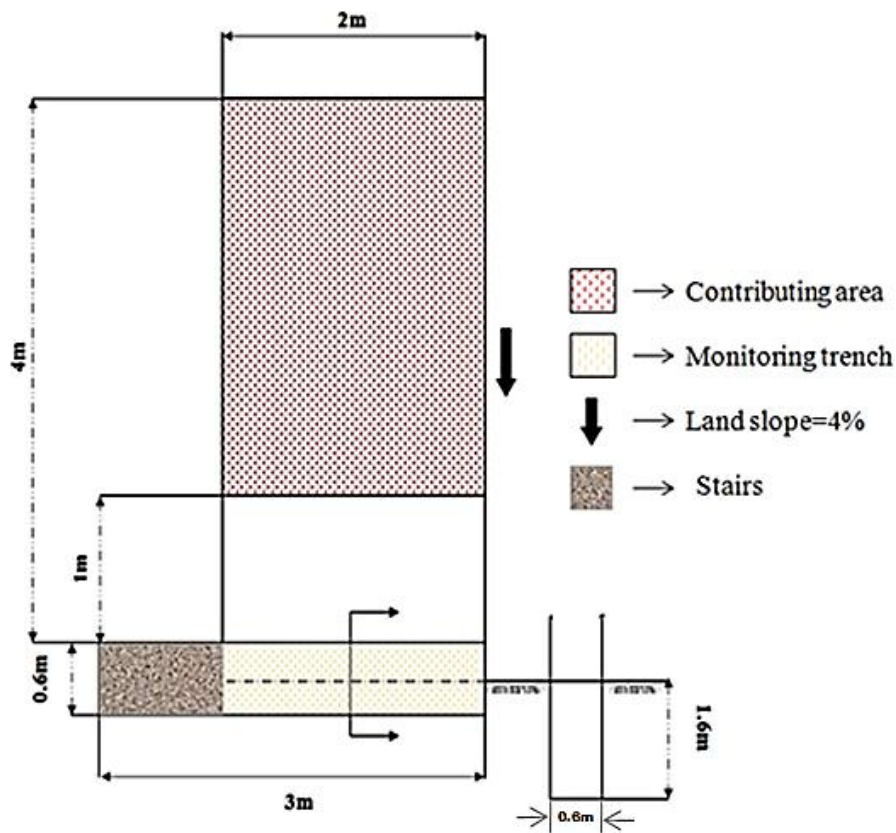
Plan view of the experimental set up 5 installed at site 3
